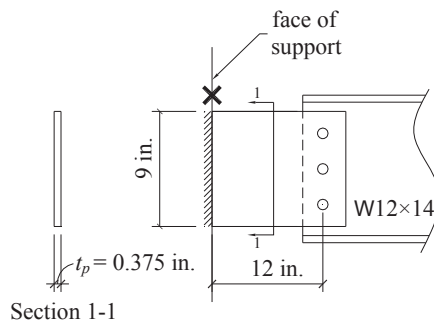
Example 3; beam used in Example 2, but with a shear tab connection.
